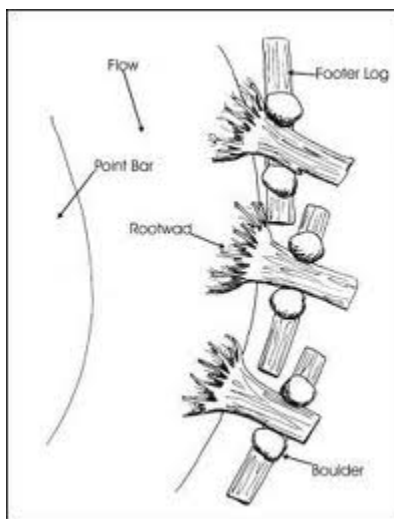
Arrangement of root wads in a root wad revetment structure. (Image courtesy of stormwatercenter.net)
